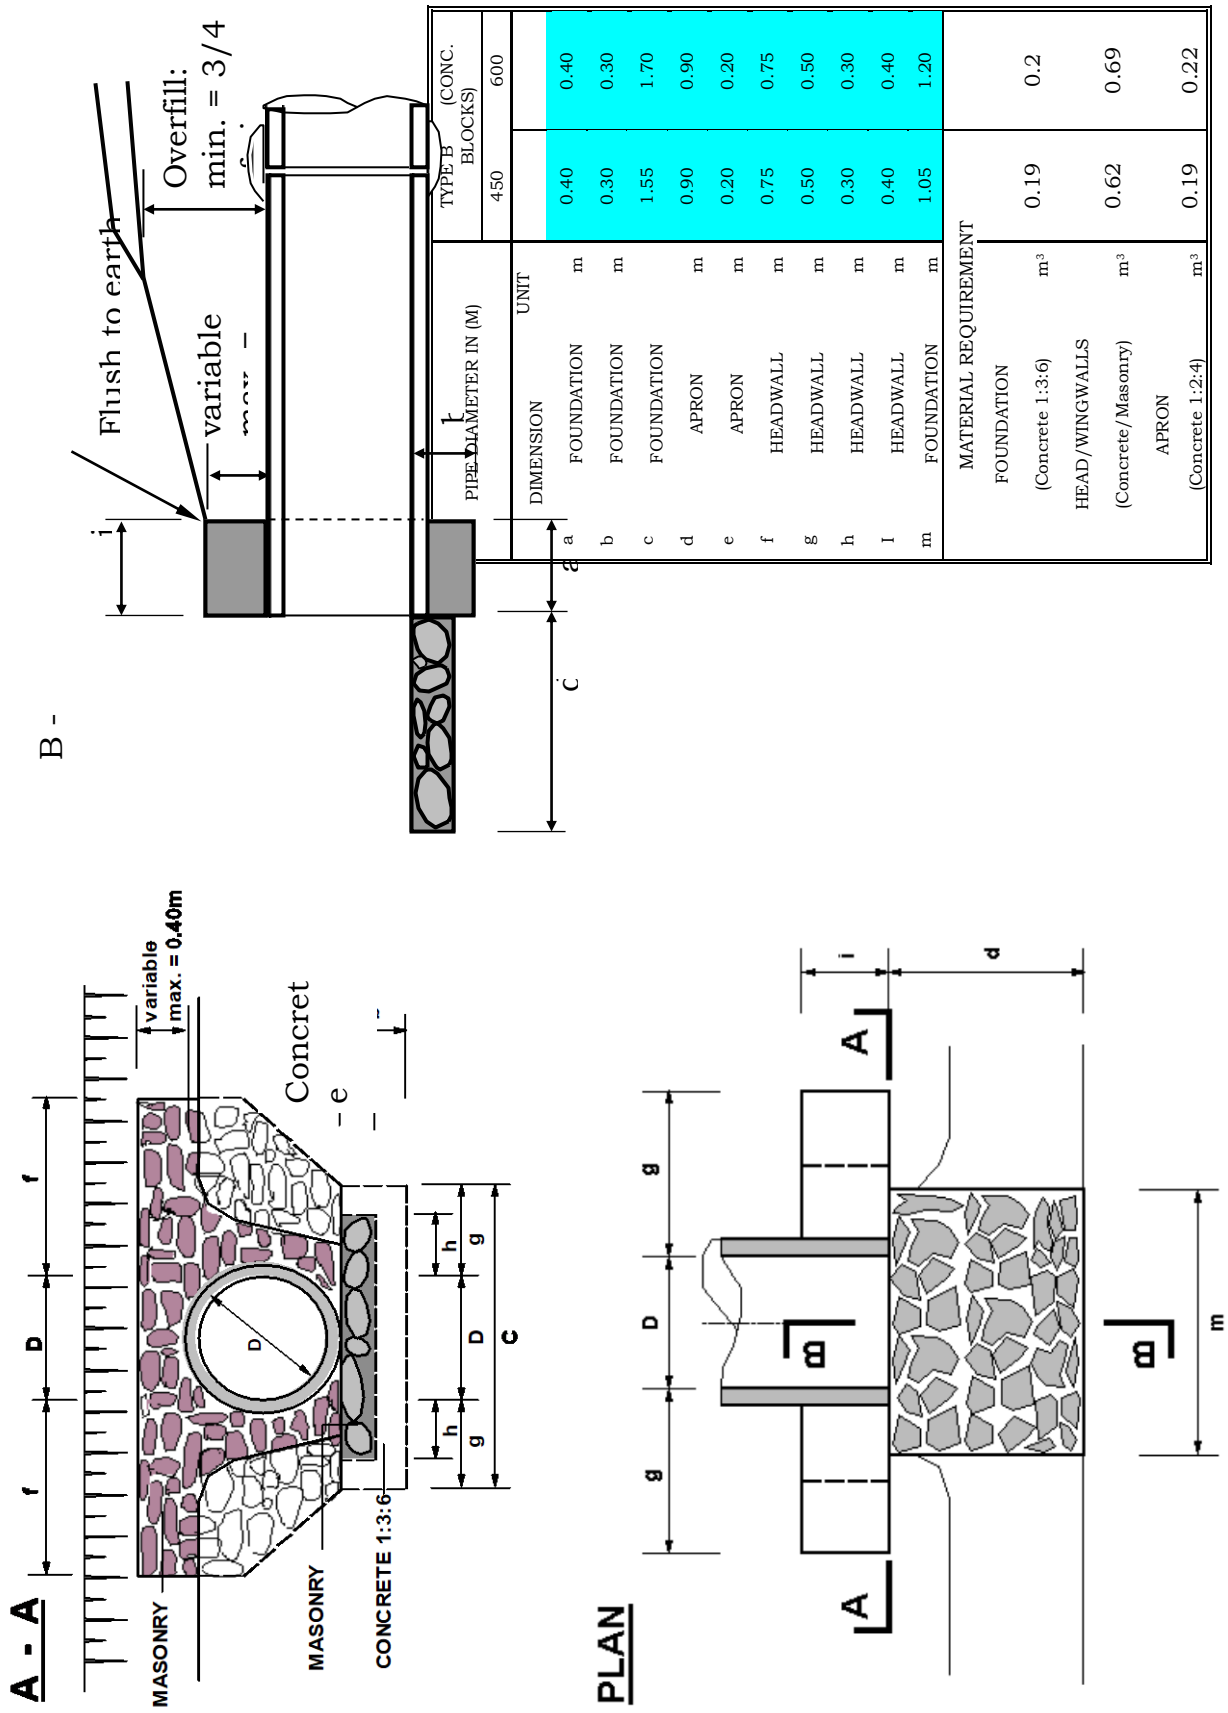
HEADWALL TYPE 4 (FOR ACCESS CULVERTS)
